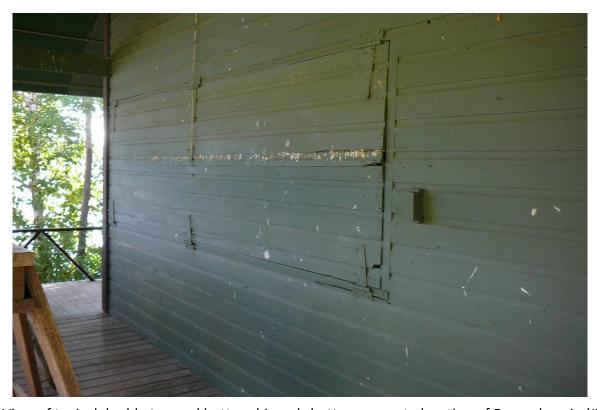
View of typical double top and bottom hinged shutters on east elevation of Beenadeewin (#1).
